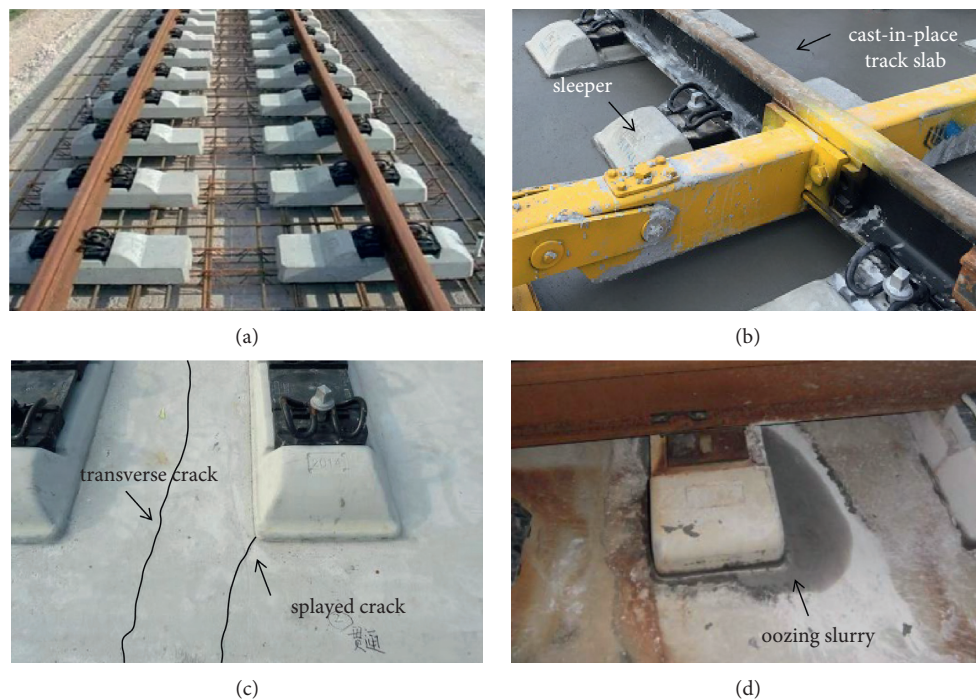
State of bi-block ballastless track at different stages. (a) Accurately adjusted and positioned sleepers [4]. (b) Cast-in-place track slab. (c) Early cracks. (d) Oozing slurry.
